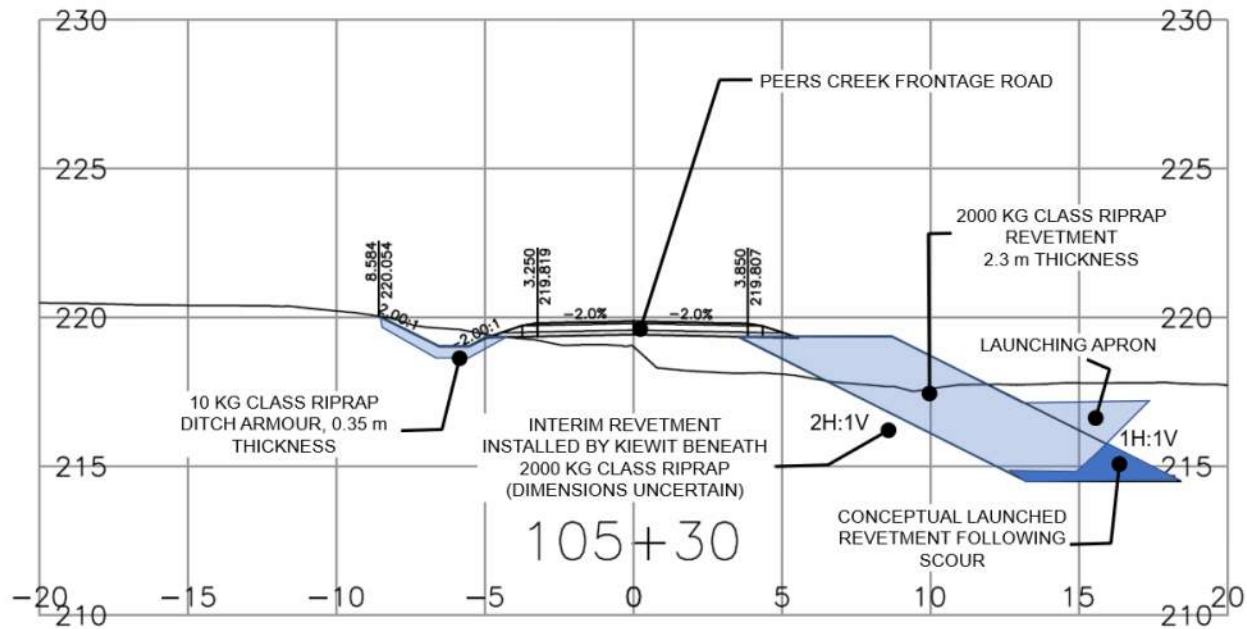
Typical cross section for riprap revetment along PCFR.
